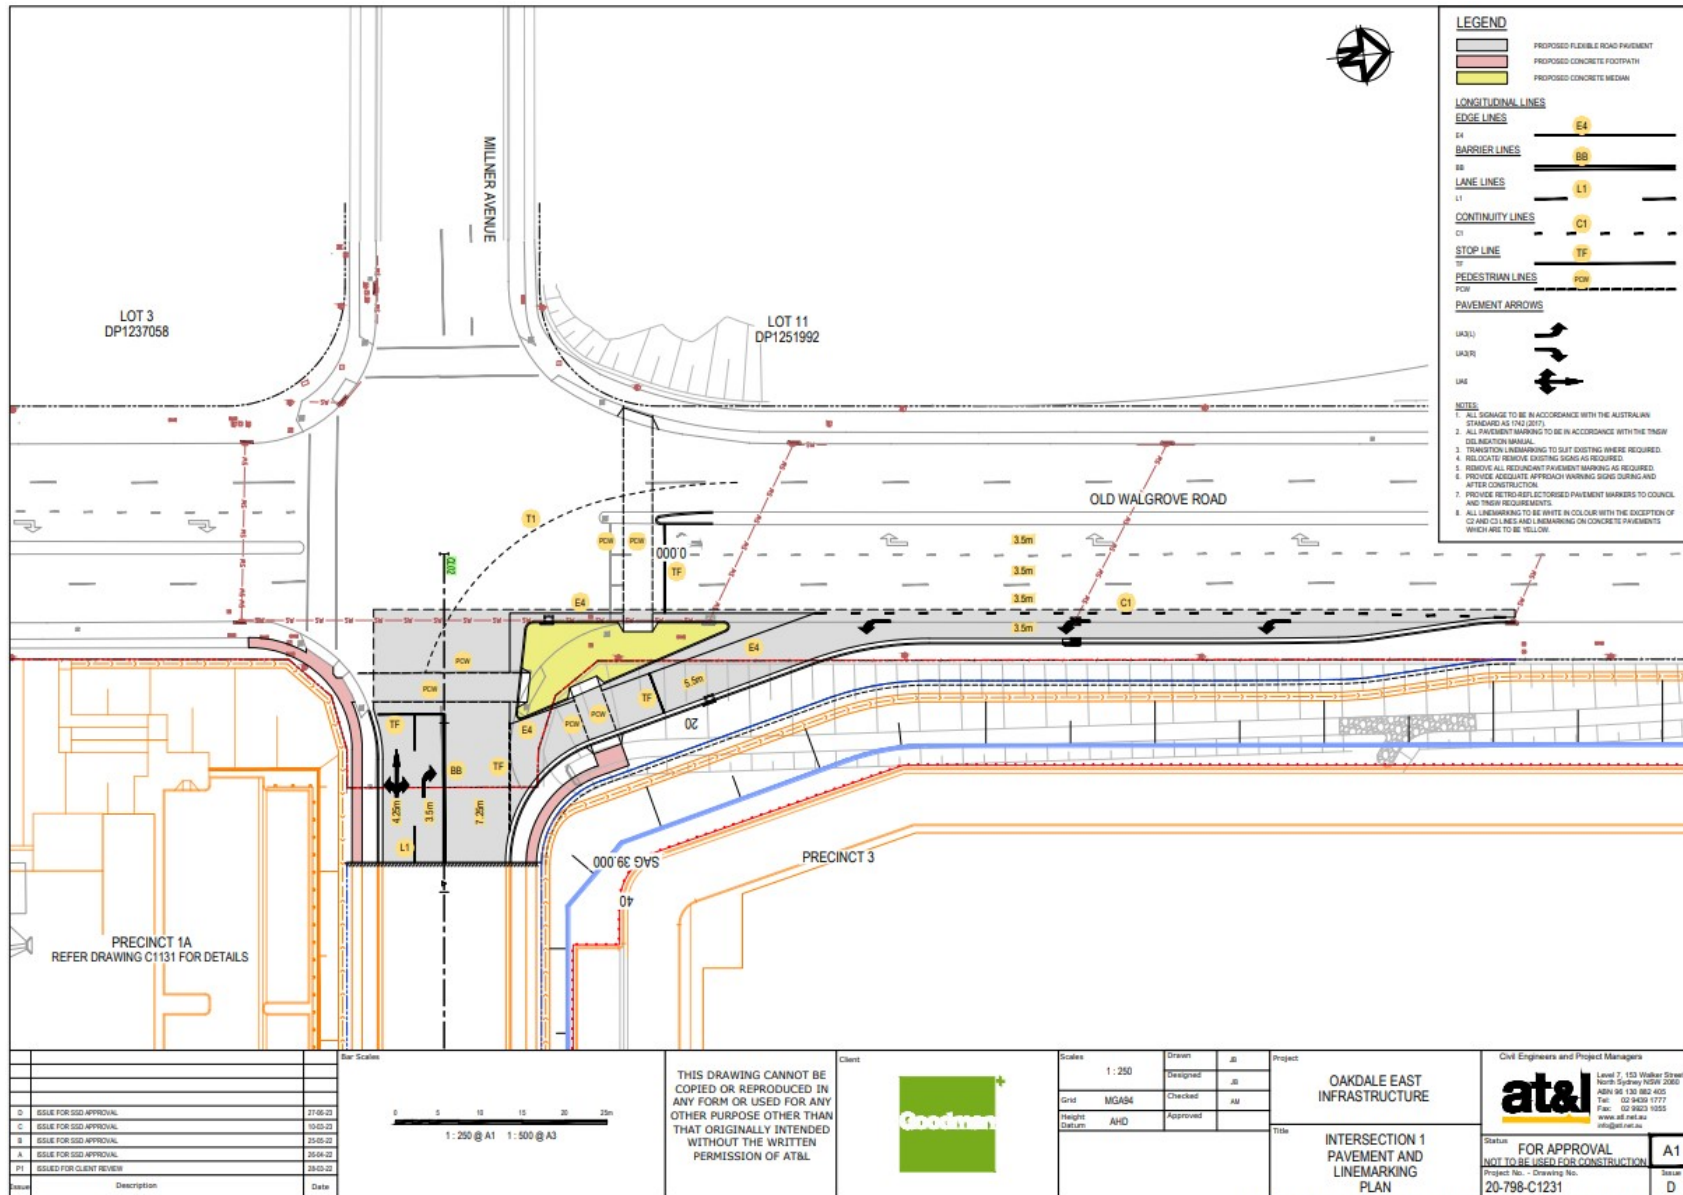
Intersection Upgrade Works – Old Wallgrove Road / Millner Avenue (site entrance)
